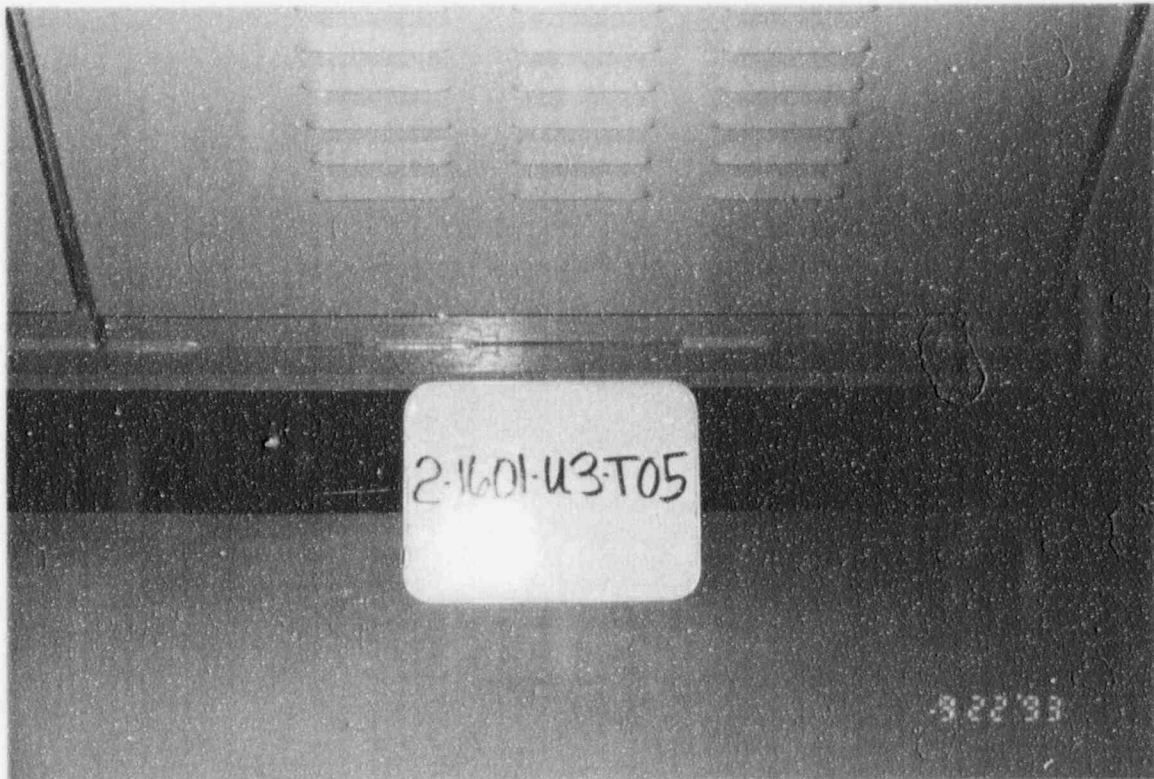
Welded Anchorage for the Main Control Board Termination Cabinet (2-1601-U3-T05)
